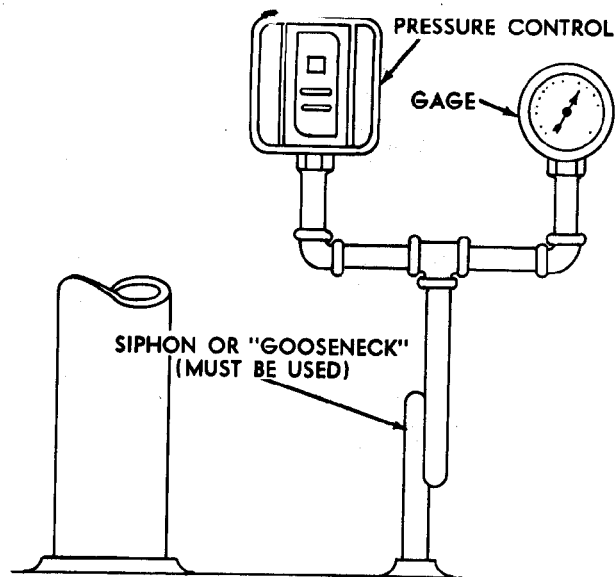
Pressure control and pressure gage mounted on boiler.
